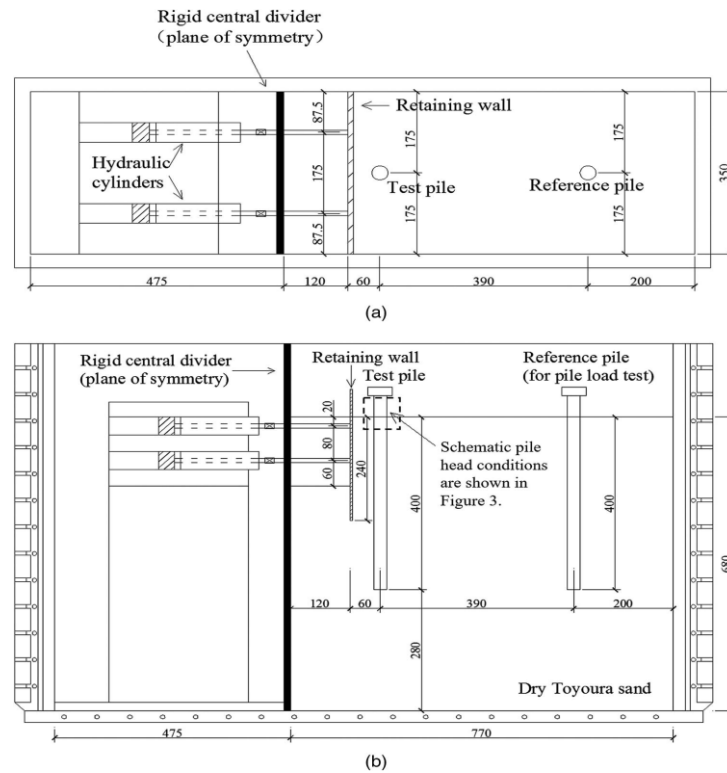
Centrifuge model setup (a) plan view (b) elevation view (Ng et al. 2017)
